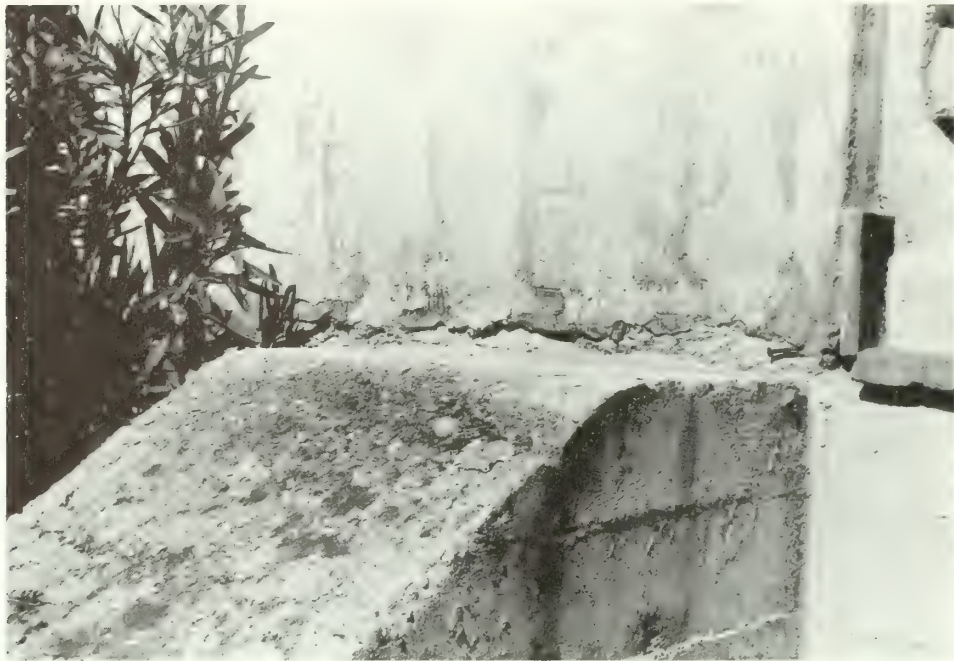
Concrete wall at south porch, Main House. An example of concrete work left exposed when construction stopped in 1931. Most concrete work had been intended to be finished with tile or stucco. Weathering and moisture intrusion are causing gradual deterioration. The crack at the juncture of the stucco and concrete is a typical source of water intrusion. (Photo by D. Snow.)
